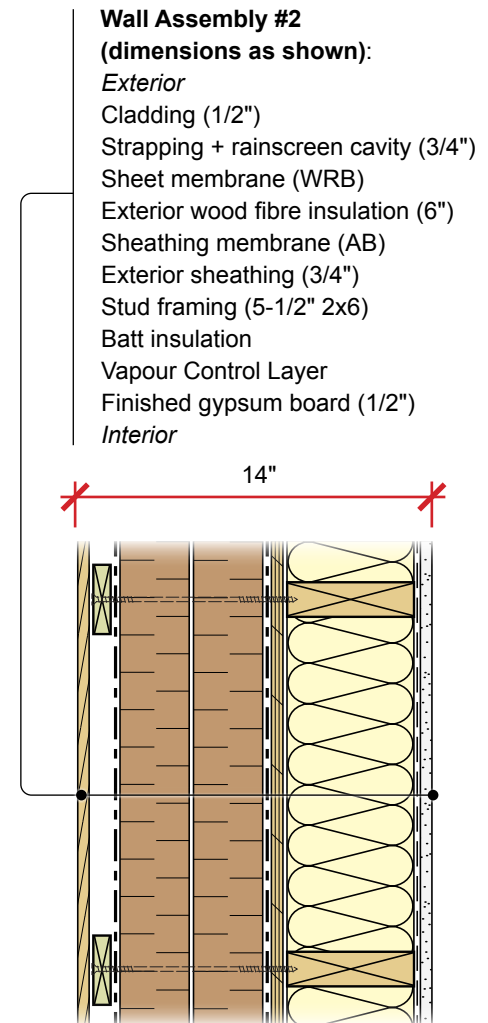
Typical assembly layers of the split-insulated wall with exterior wood fibre insulation
